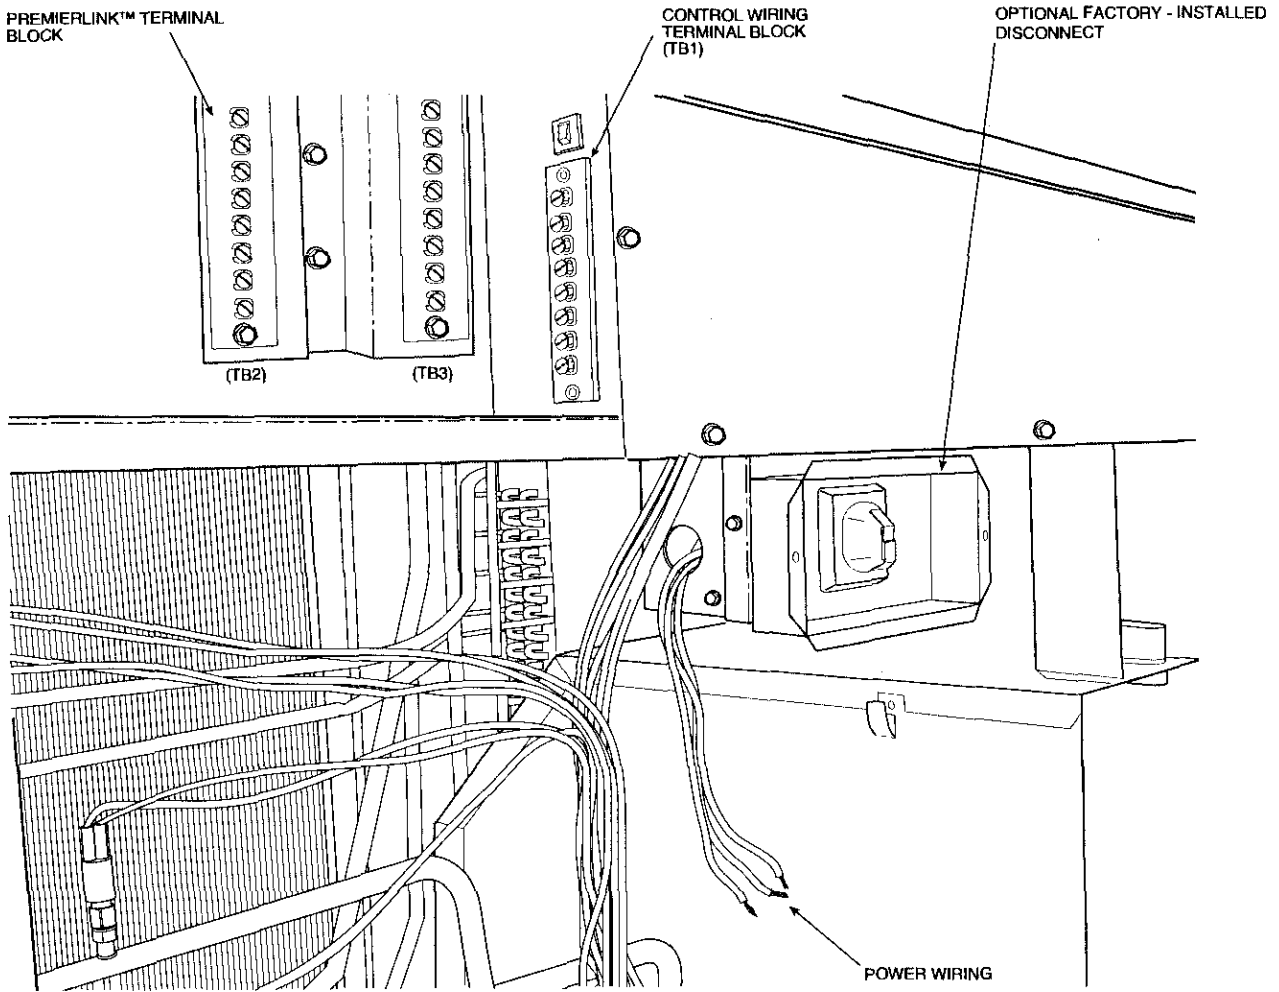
Field Wiring Connections (Terminal Blocks in Rooftop Unit Section)
